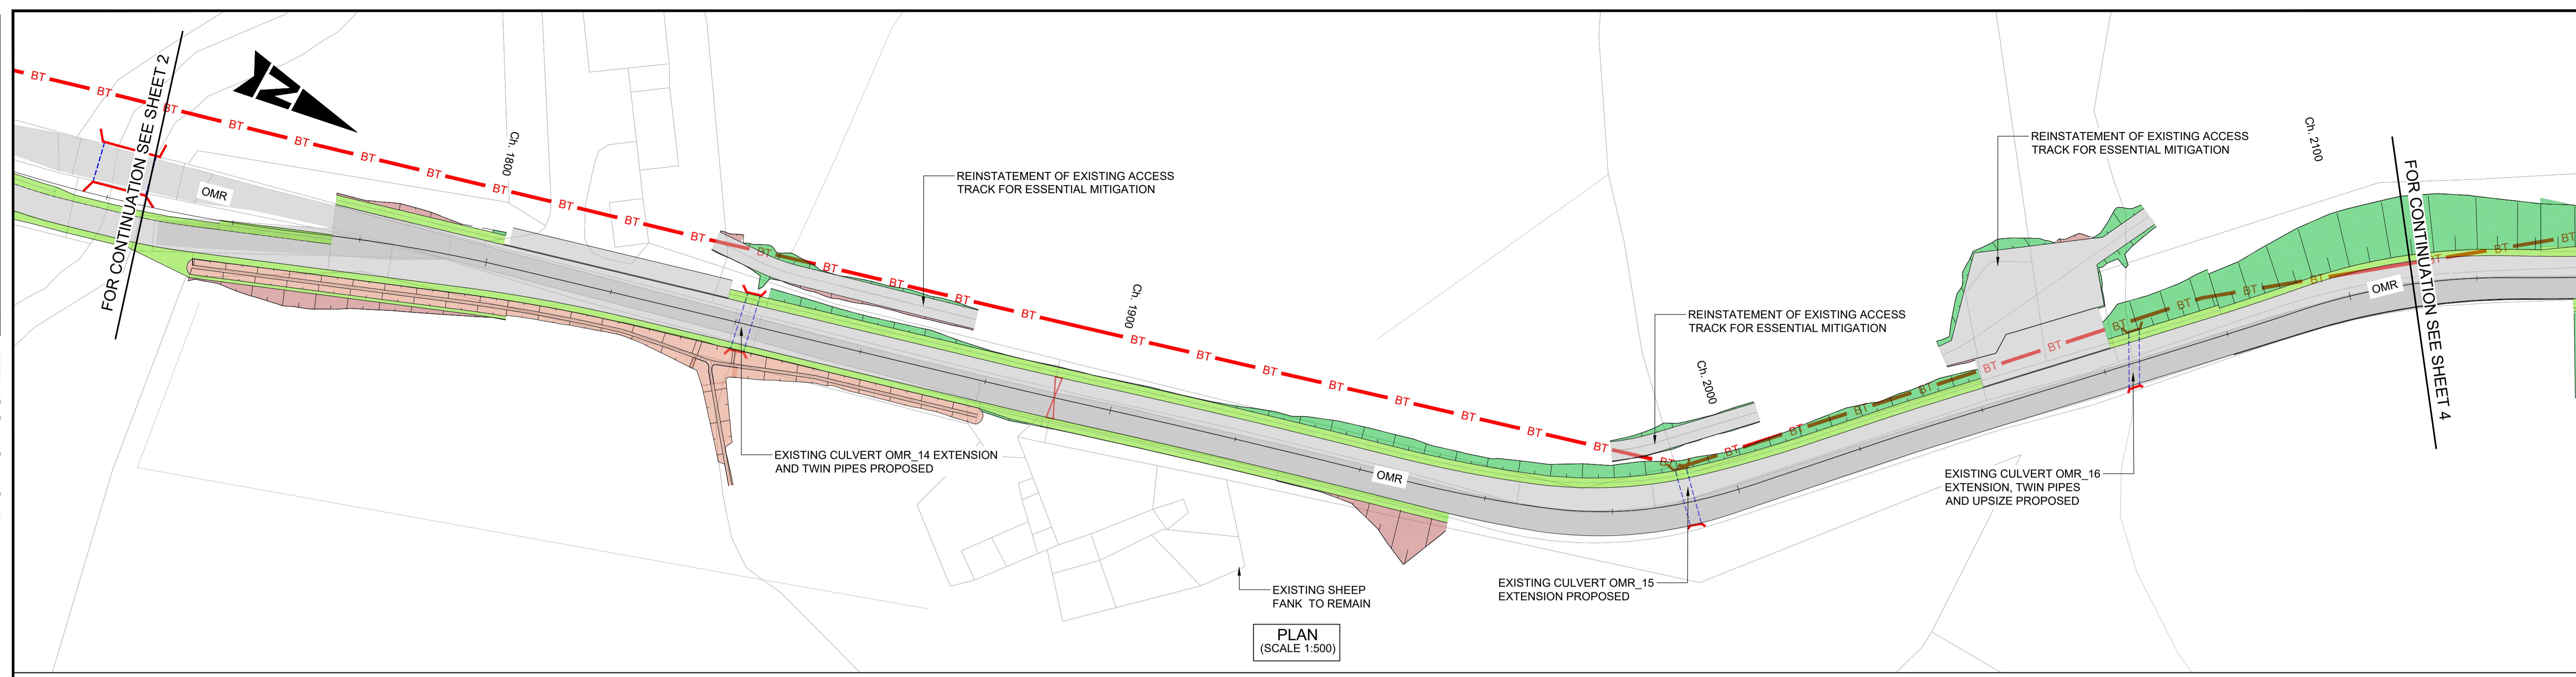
Drawing Number: A83AAB - AWJ - HGN - MTS_MBO - DR-CH-000051
